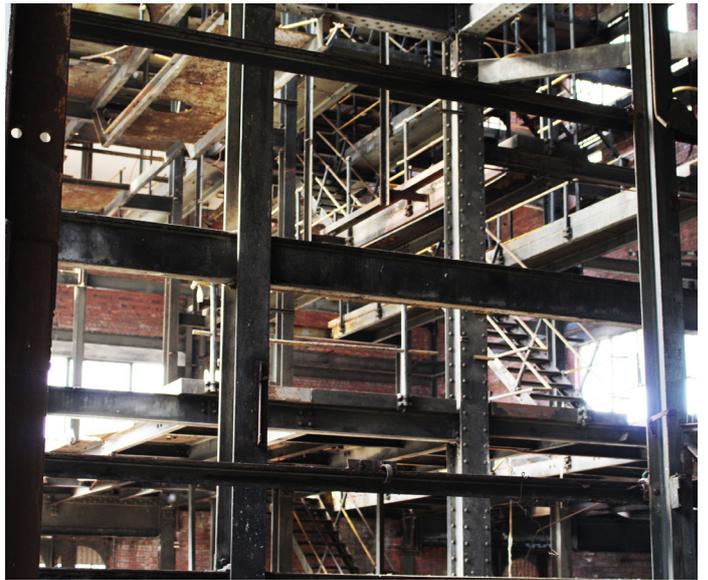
CWG plant Eastern elevation with structure expressed in facade
